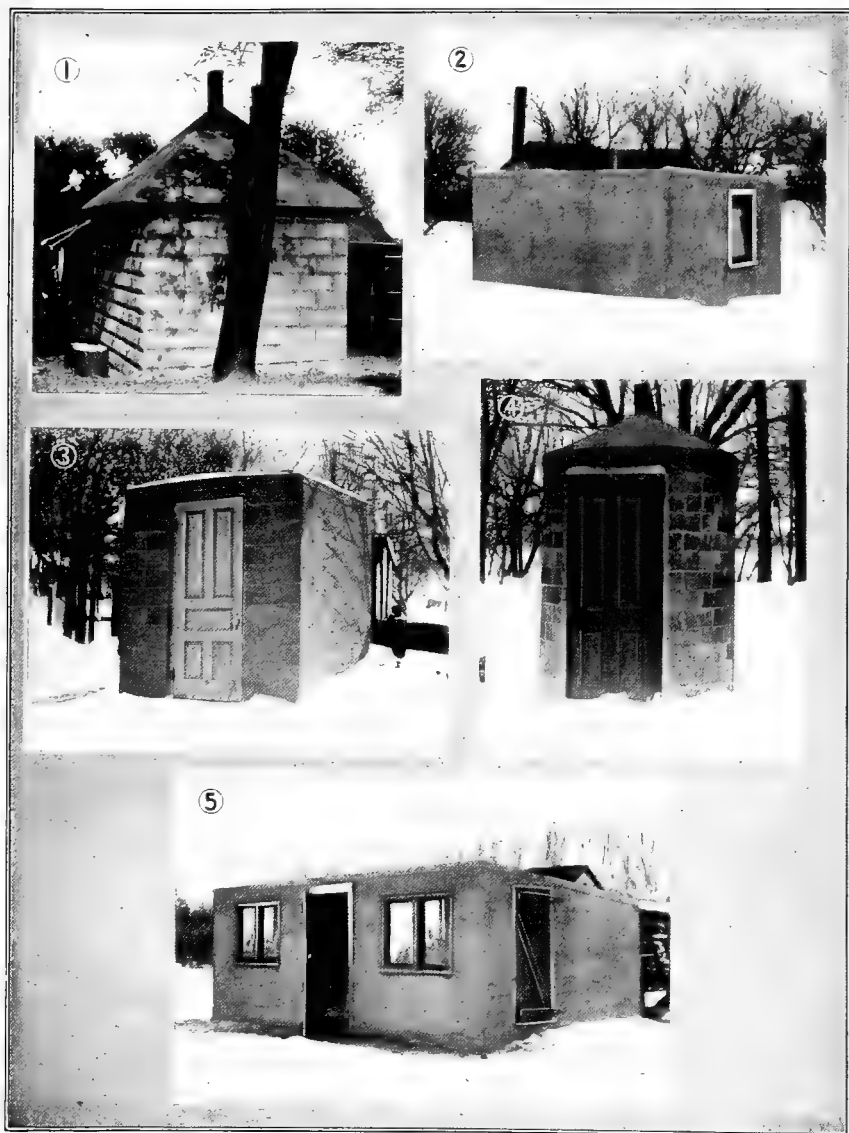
SMALL CONCRETE BUILDINGS ERECTED BY OWNERS
